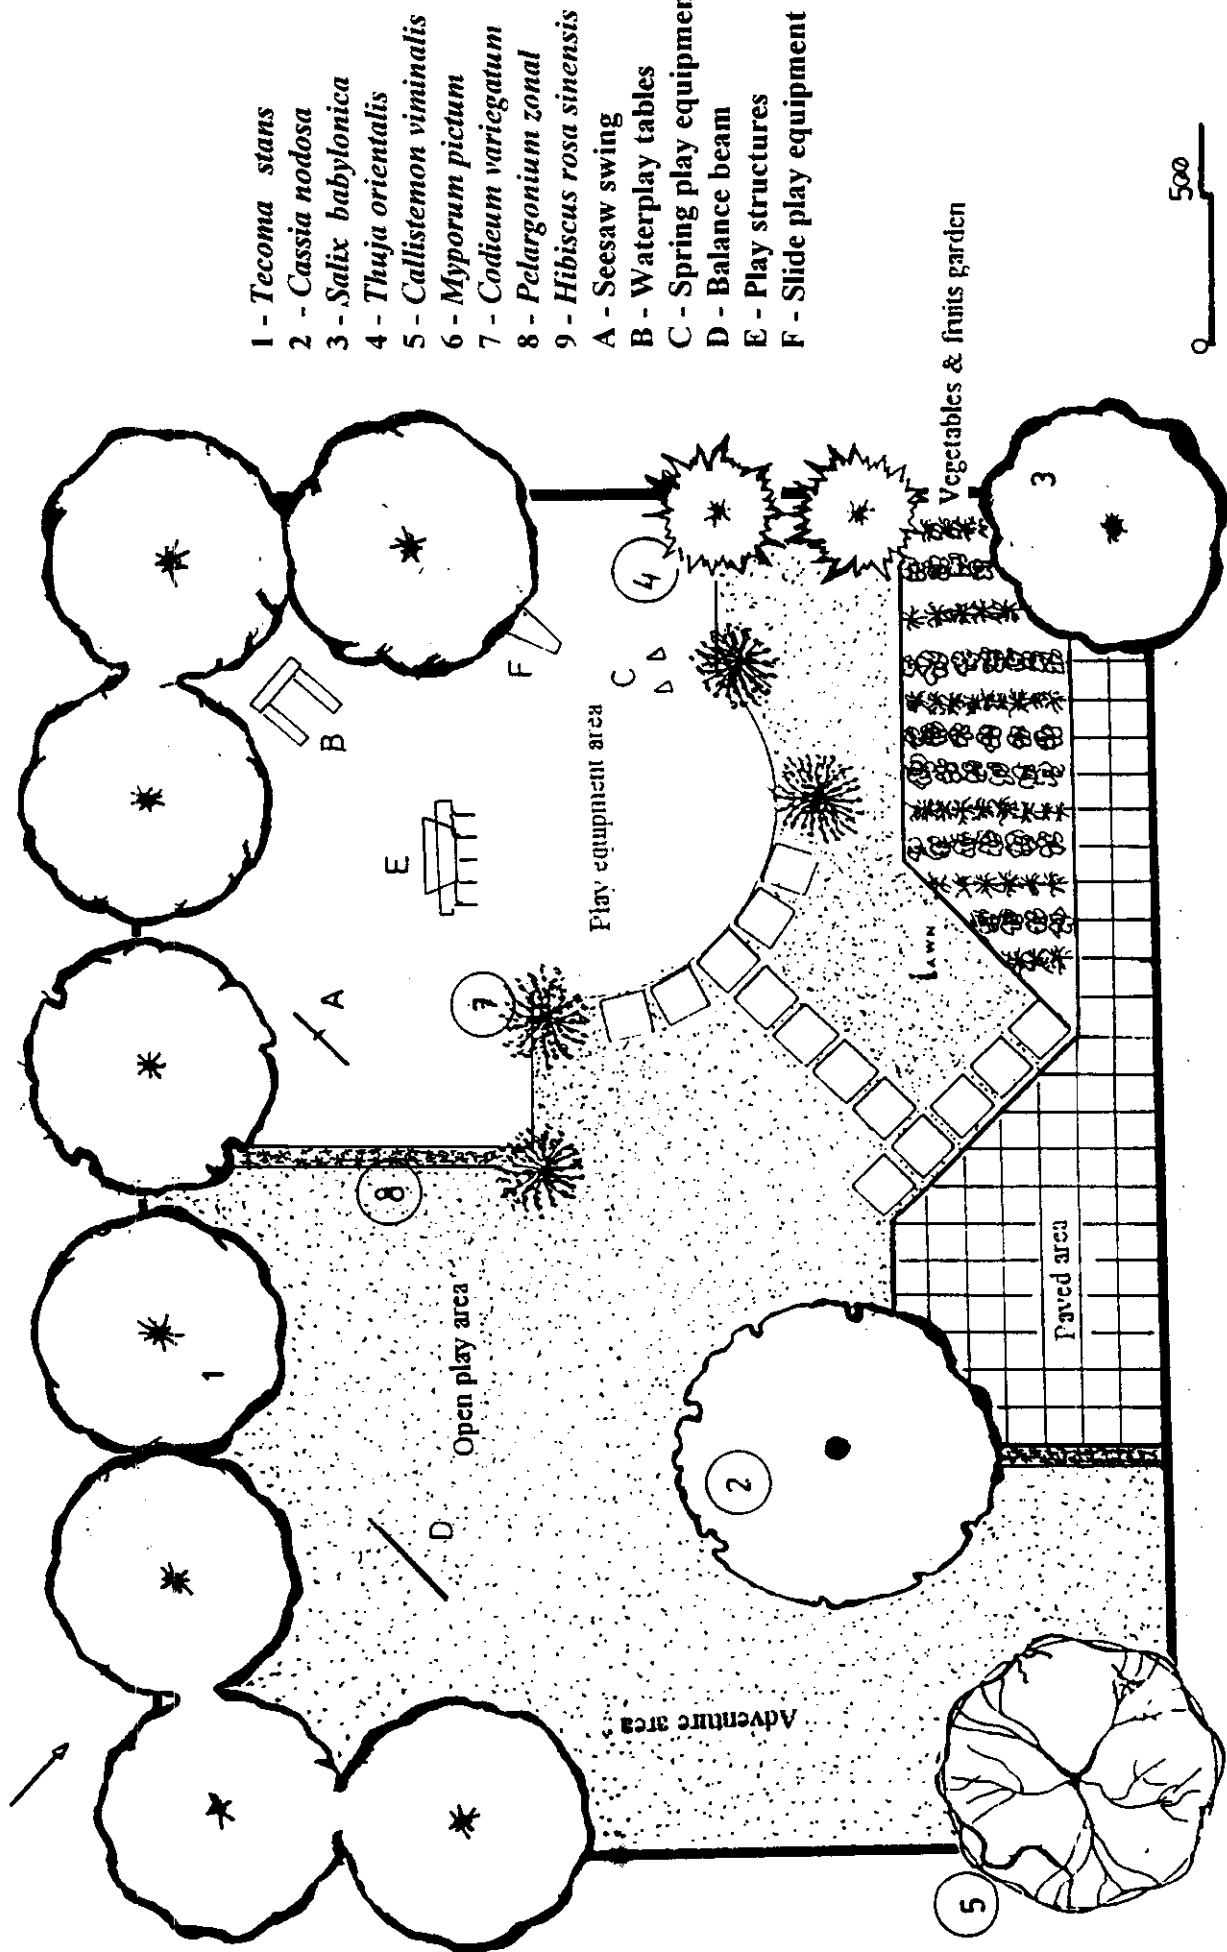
A proposed design for kindergarten garden in an area 600 m.
